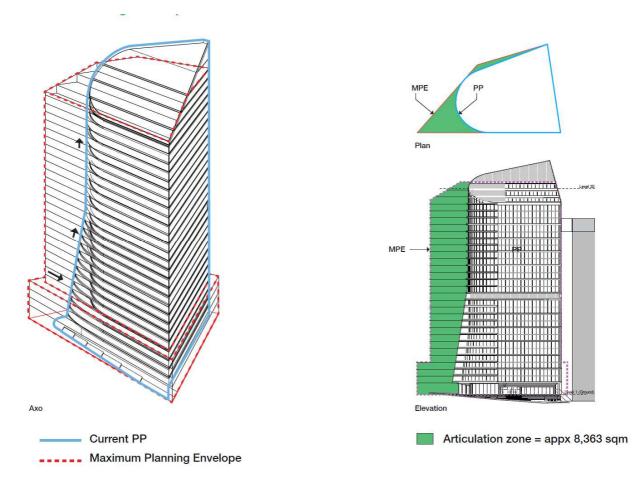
Comparison of the proposed concept and the 2036 Plan envelope
